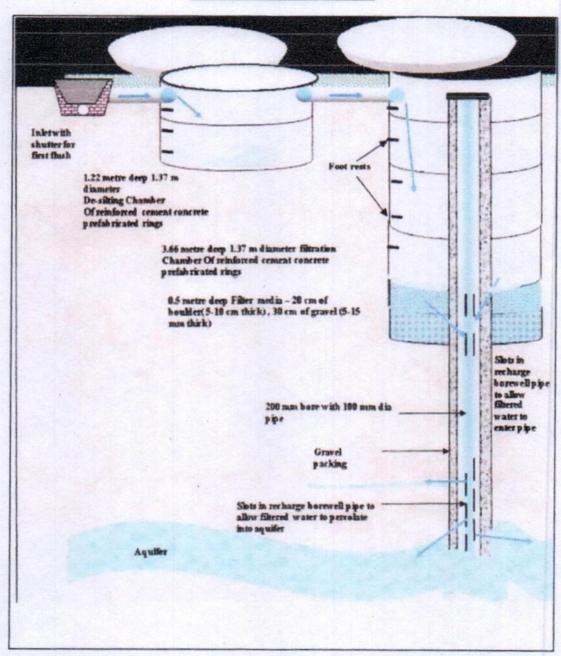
DETAILS OF RECHARGE STRUCTURES PROPOSED:
